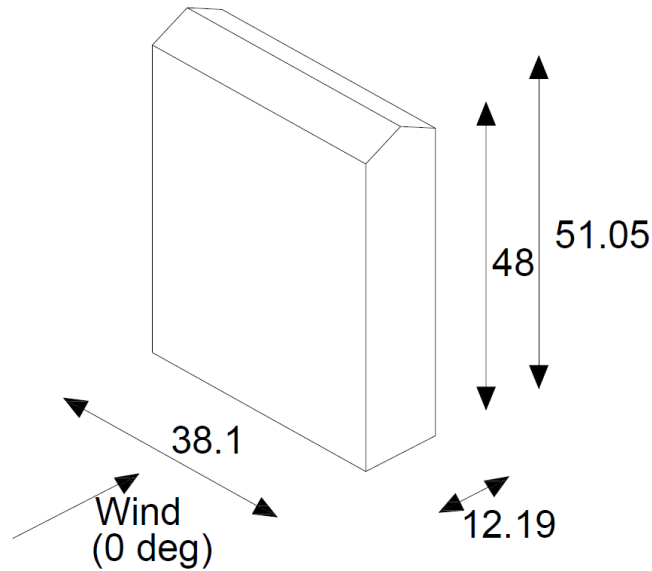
Geometry of the benchmark gable-roofed building (full-scale dimensions, in meters).
